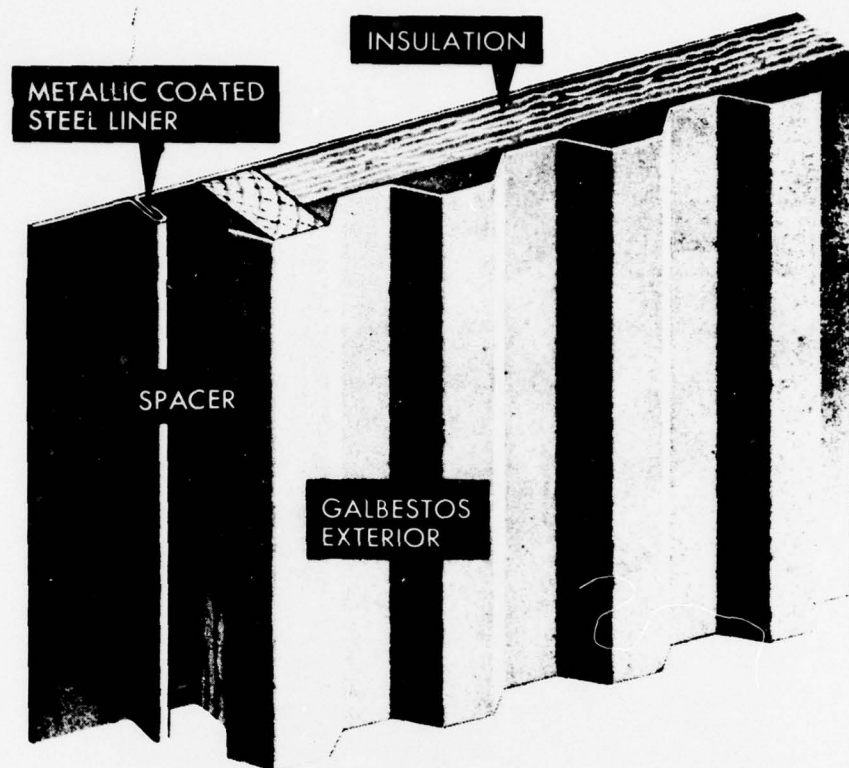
Typical building panel in permanent structures at McMurdo Station.
